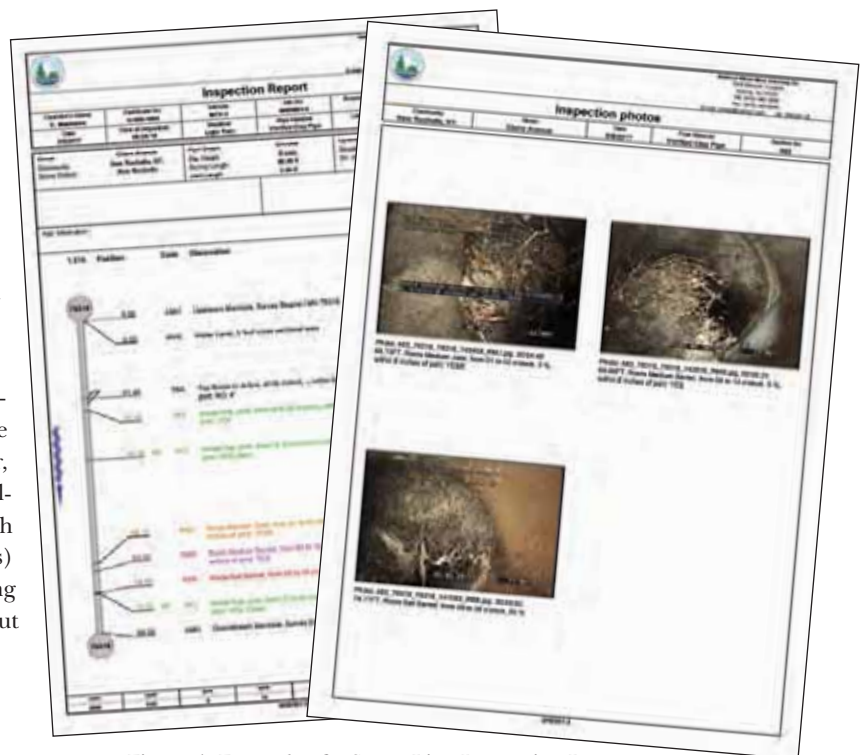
Example of a Sewer Pipe Inspection Report.
